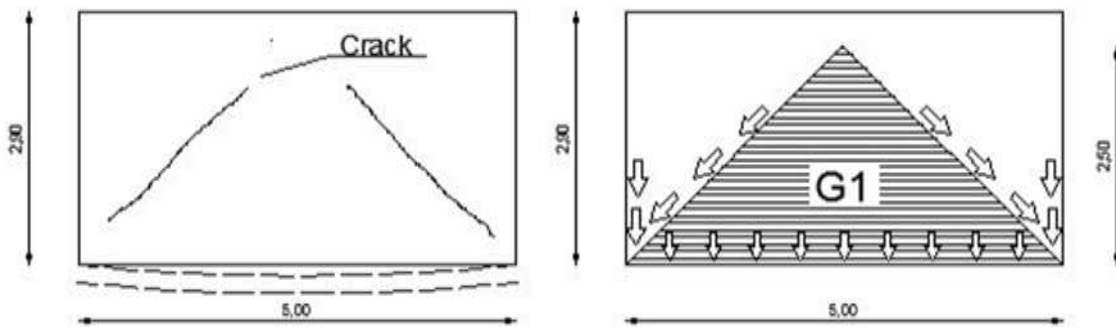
Cracks when deforming support beam of 5m. And creep loads.Loads calculation.
